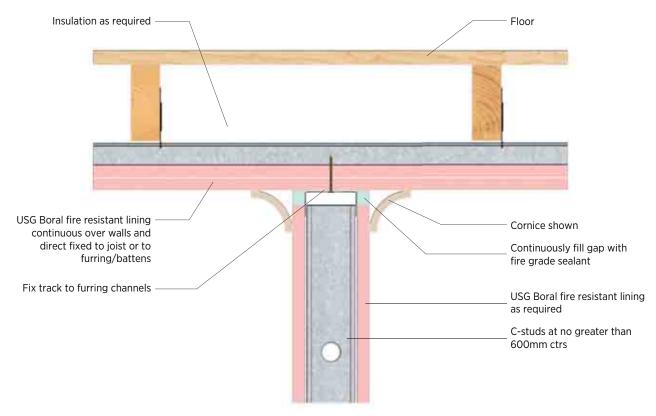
Fire Rated Wall to Fire Rated Ceiling Detail
